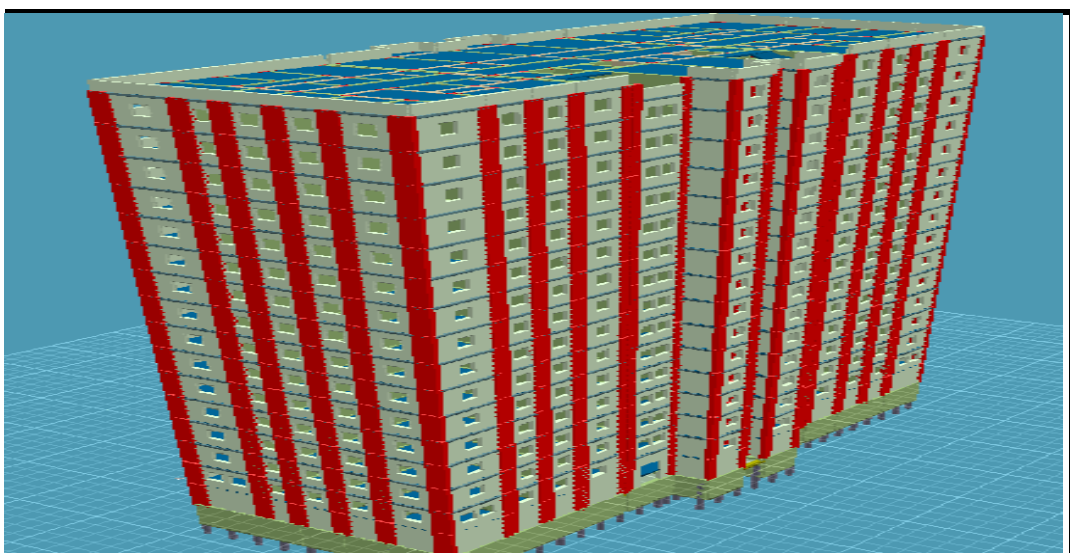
The 3D view of a Building with Fifteen Stories and Tunnel Formwork
